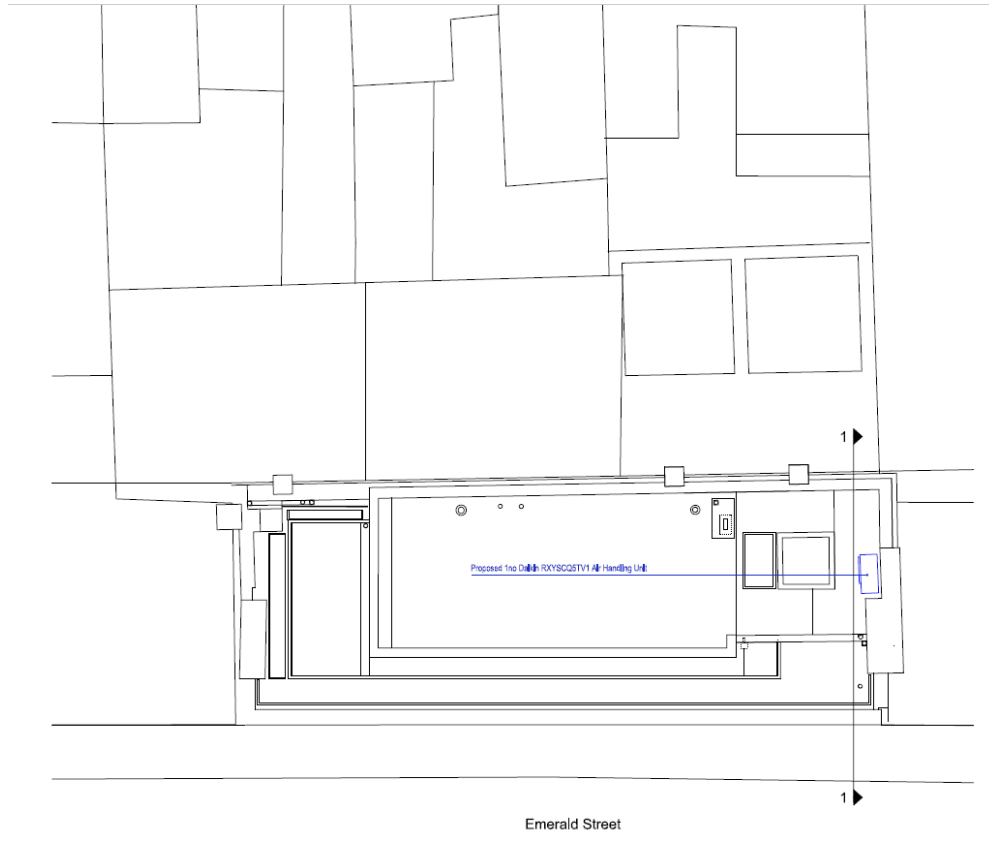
Proposed Location of A/C unit on 6-8 Emerald Street Roof
